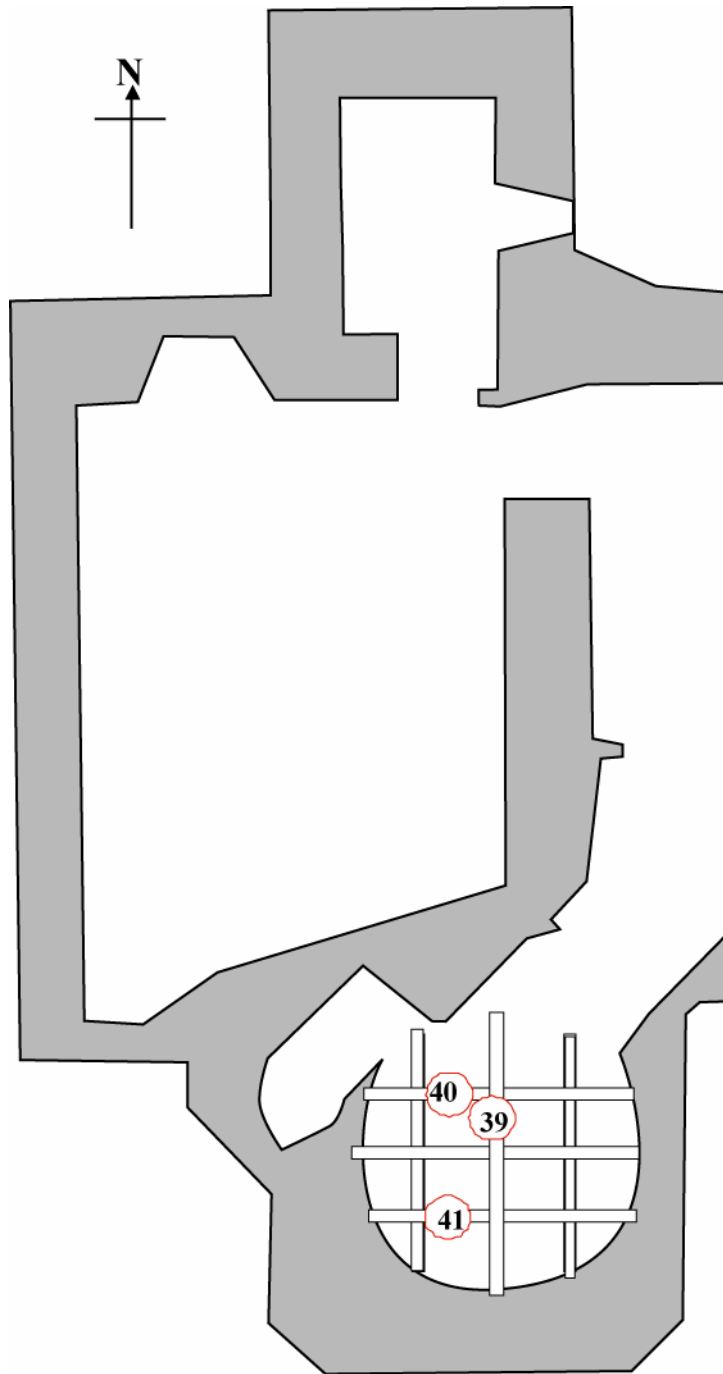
Simple plan of the ceiling to the main spiral staircase to show sampled timbers (after Marius Barran)
